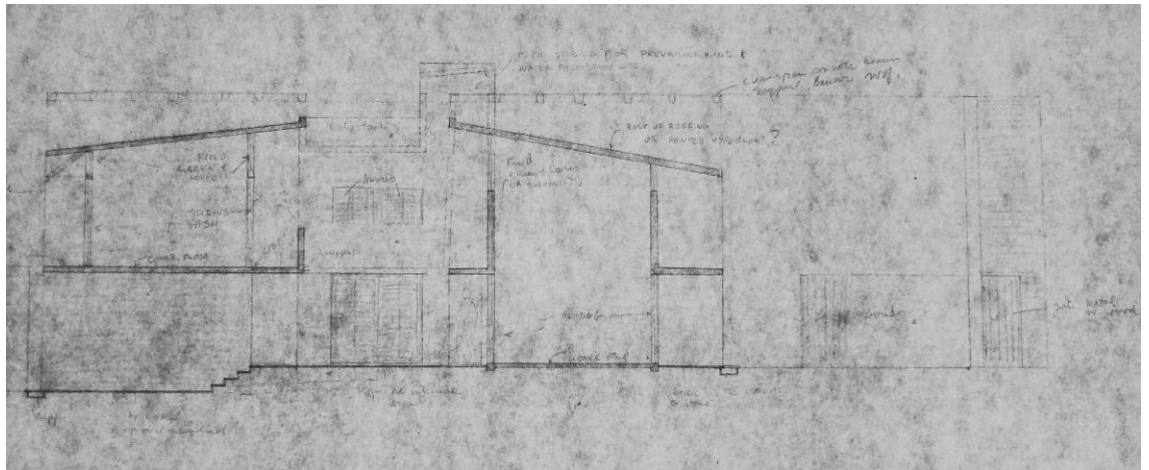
Housing section, late 1963 (Annotation: “clearspan concrete beam support bamboo roof”).
